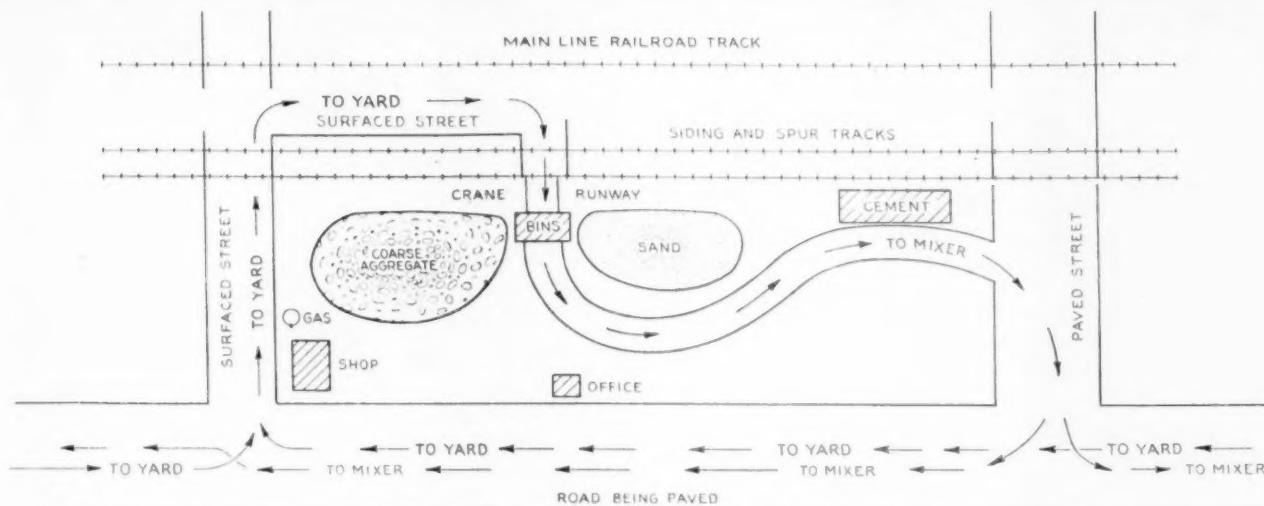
PLAN OF A GOOD YARD LAYOUT FOR CONCRETE PAVING WORK
